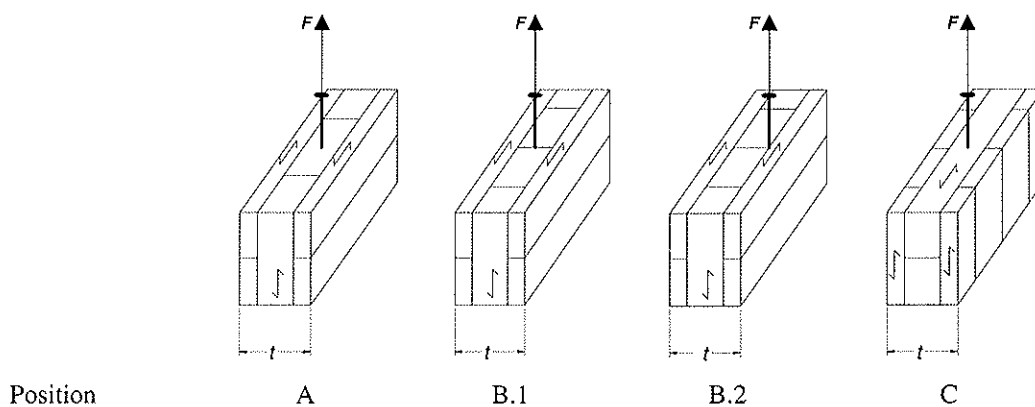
Set-up for edge withdrawal tests with screws in CLT
